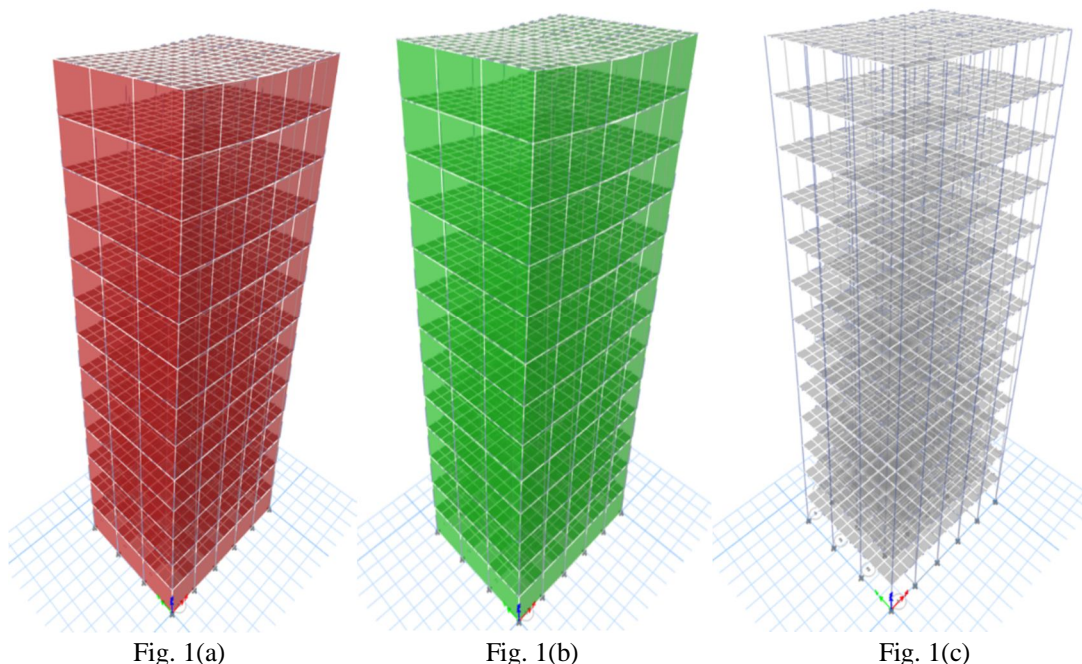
Deformed shape of (a) Brick wall (b) shear wall and (c) bare frame of G+12 multi-storey building
